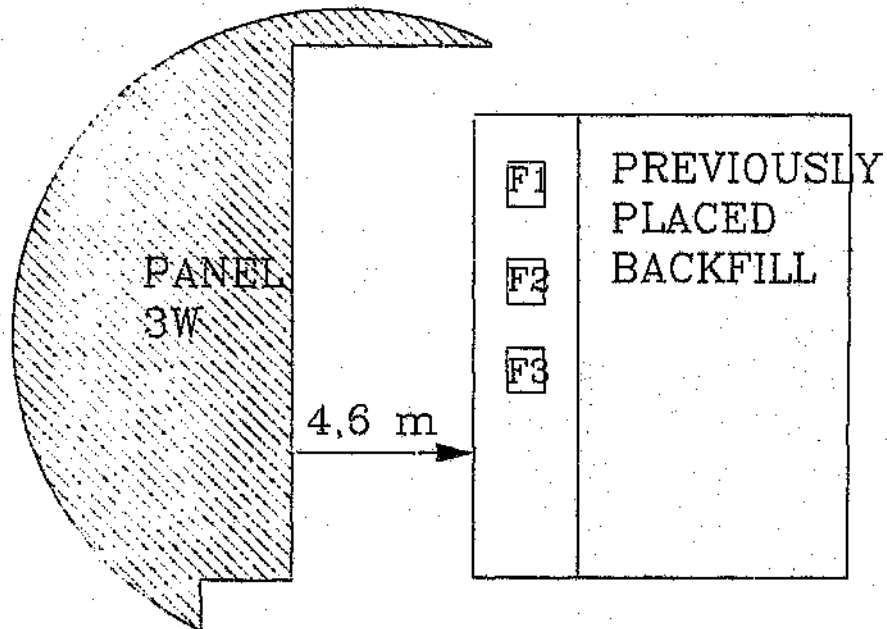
Backfill instrumentation layout at No. 2 Shaft, 14-14 stope
